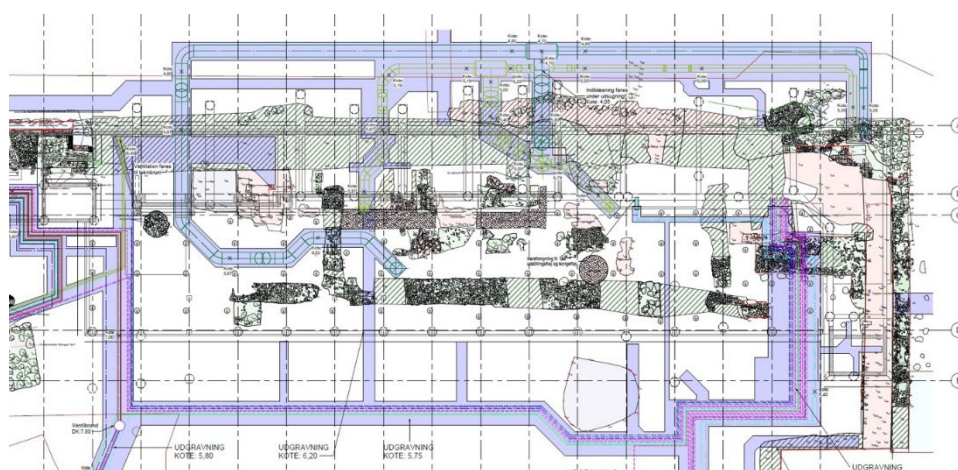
Section of a project detail plan of new foundations and technical installations in the ground that cautiously avoid touching the registered old foundations of the heritage site. Courtesy of Jaja Architects.
